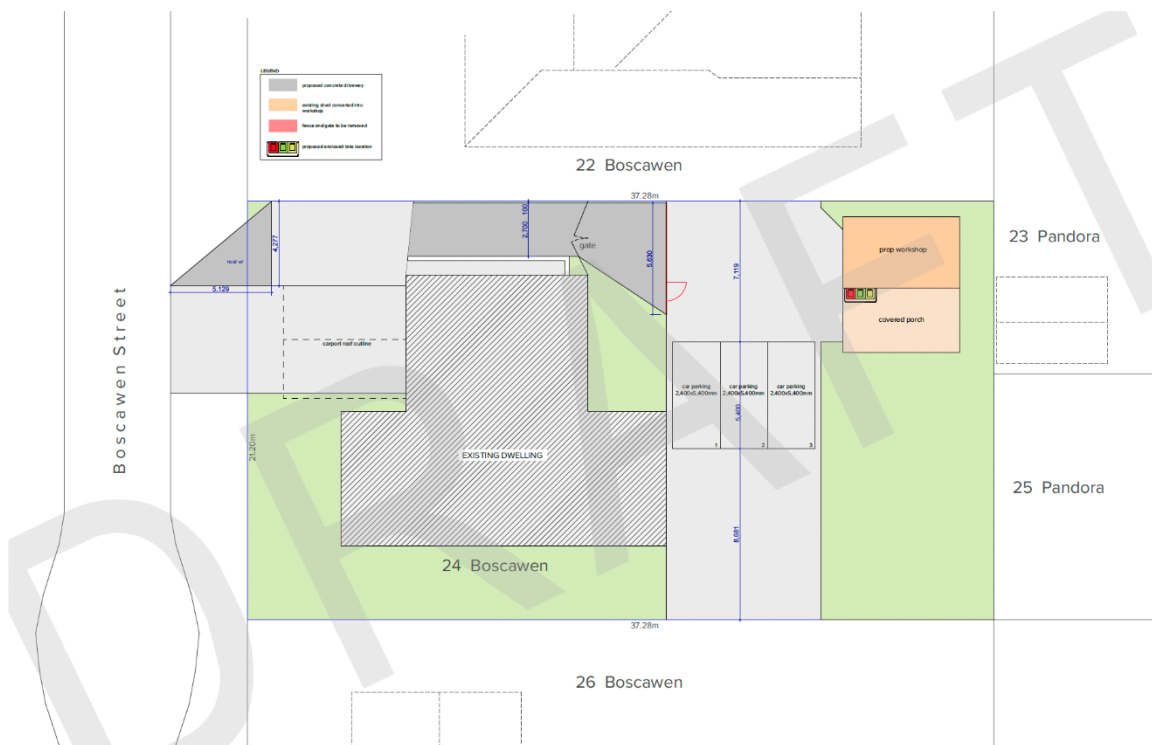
Proposed Site Plan (Source: Council Approval Group Architectural Plans (DA-002 Rev.3))
